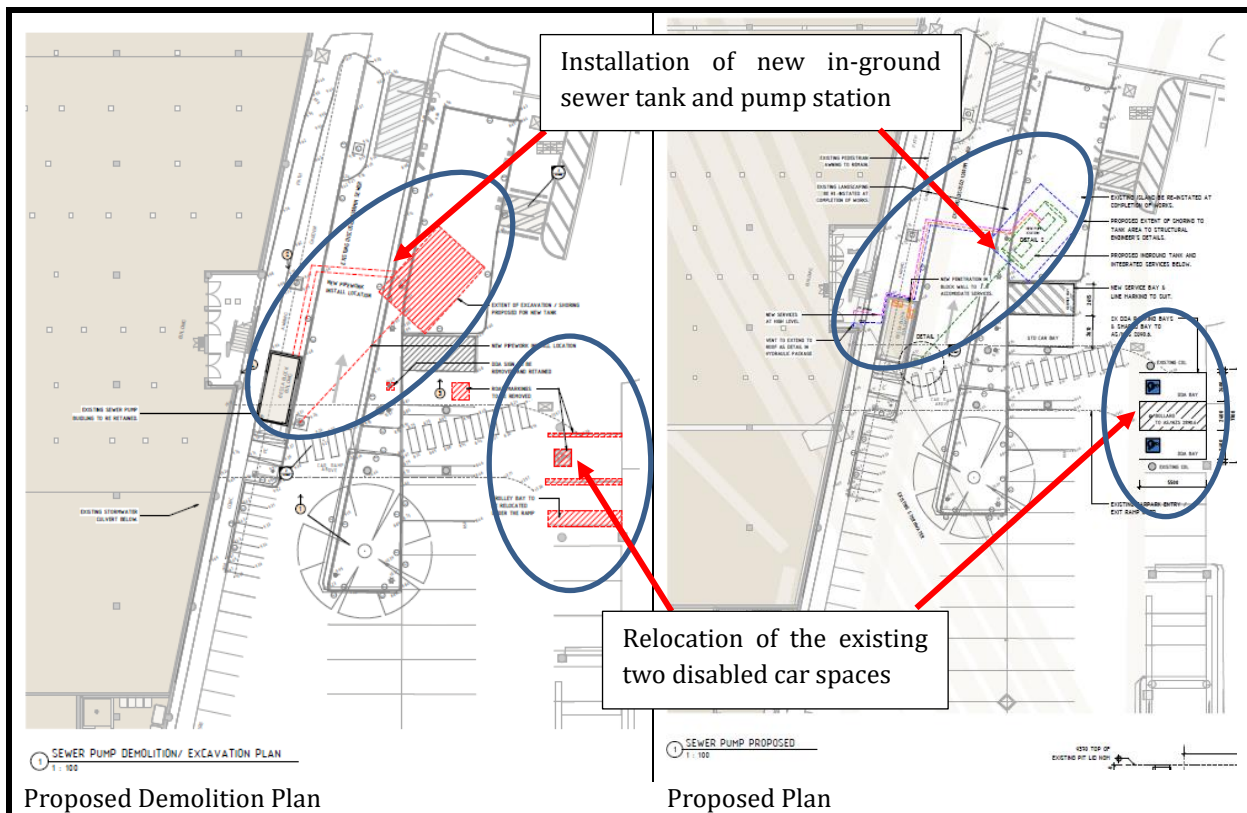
Proposed Architectural Plan Purple car park (Source Architectural Plan Prepared by Scentre Group)
